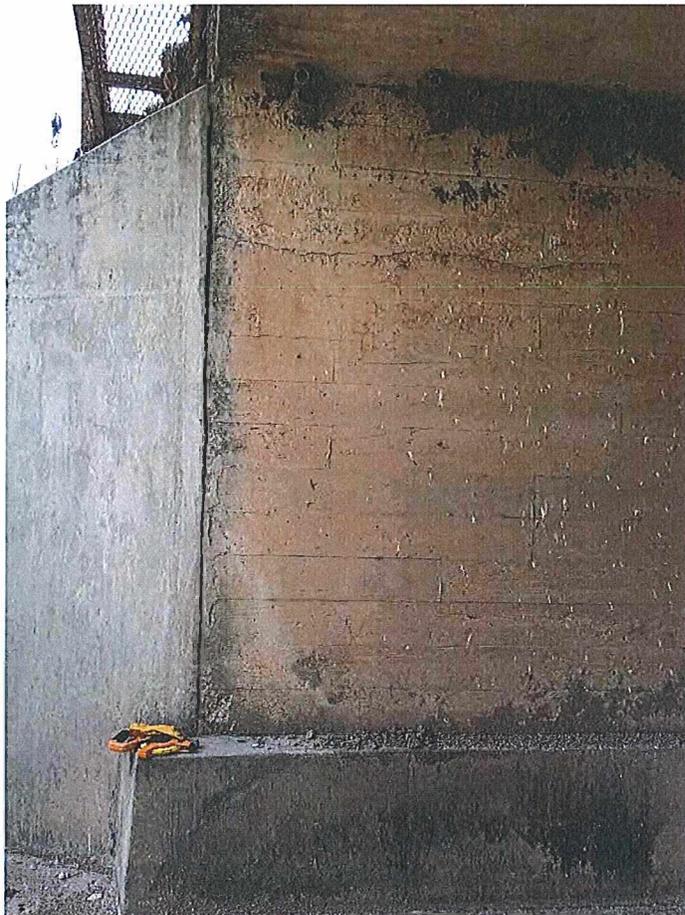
(side photo) is looking at the gap between the south abutment wall and southeast wingwall. The width of the gap opening measured 0.75" at the top and narrowed to 0" at the bottom.
